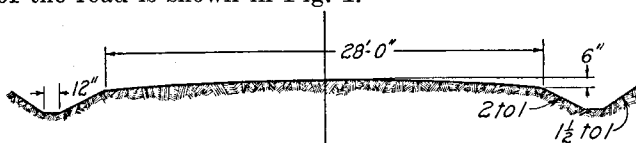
TYPICAL CROSS-SECTION OF EXPERIMENTAL EARTH ROAD
